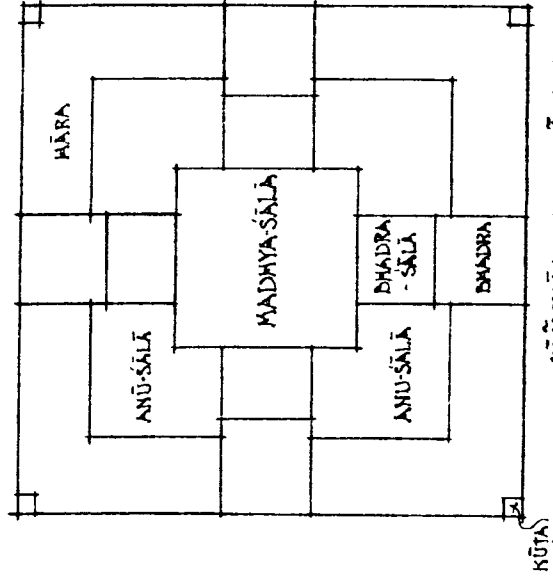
INTERMEDIATE SIZE — 34 PARTS
